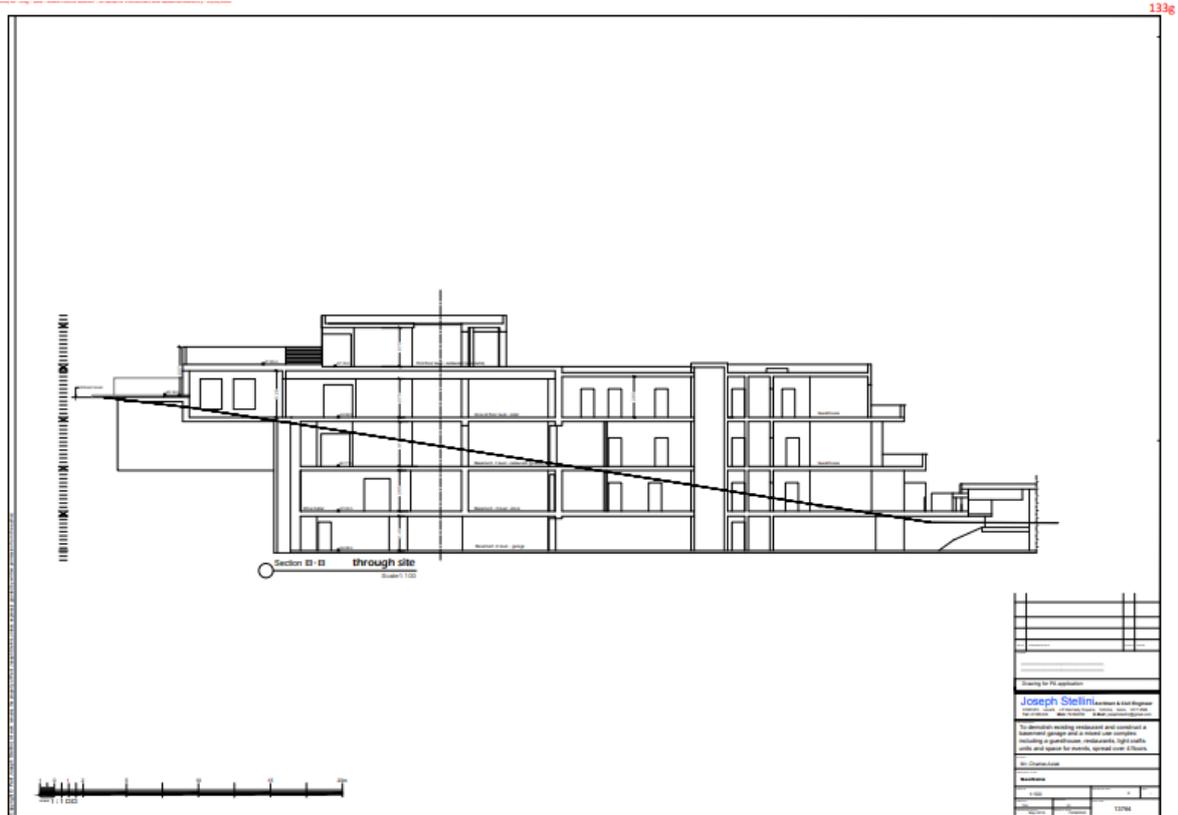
Proposed Section B-B (Source: E- apps doc PA9046/18/133g)
